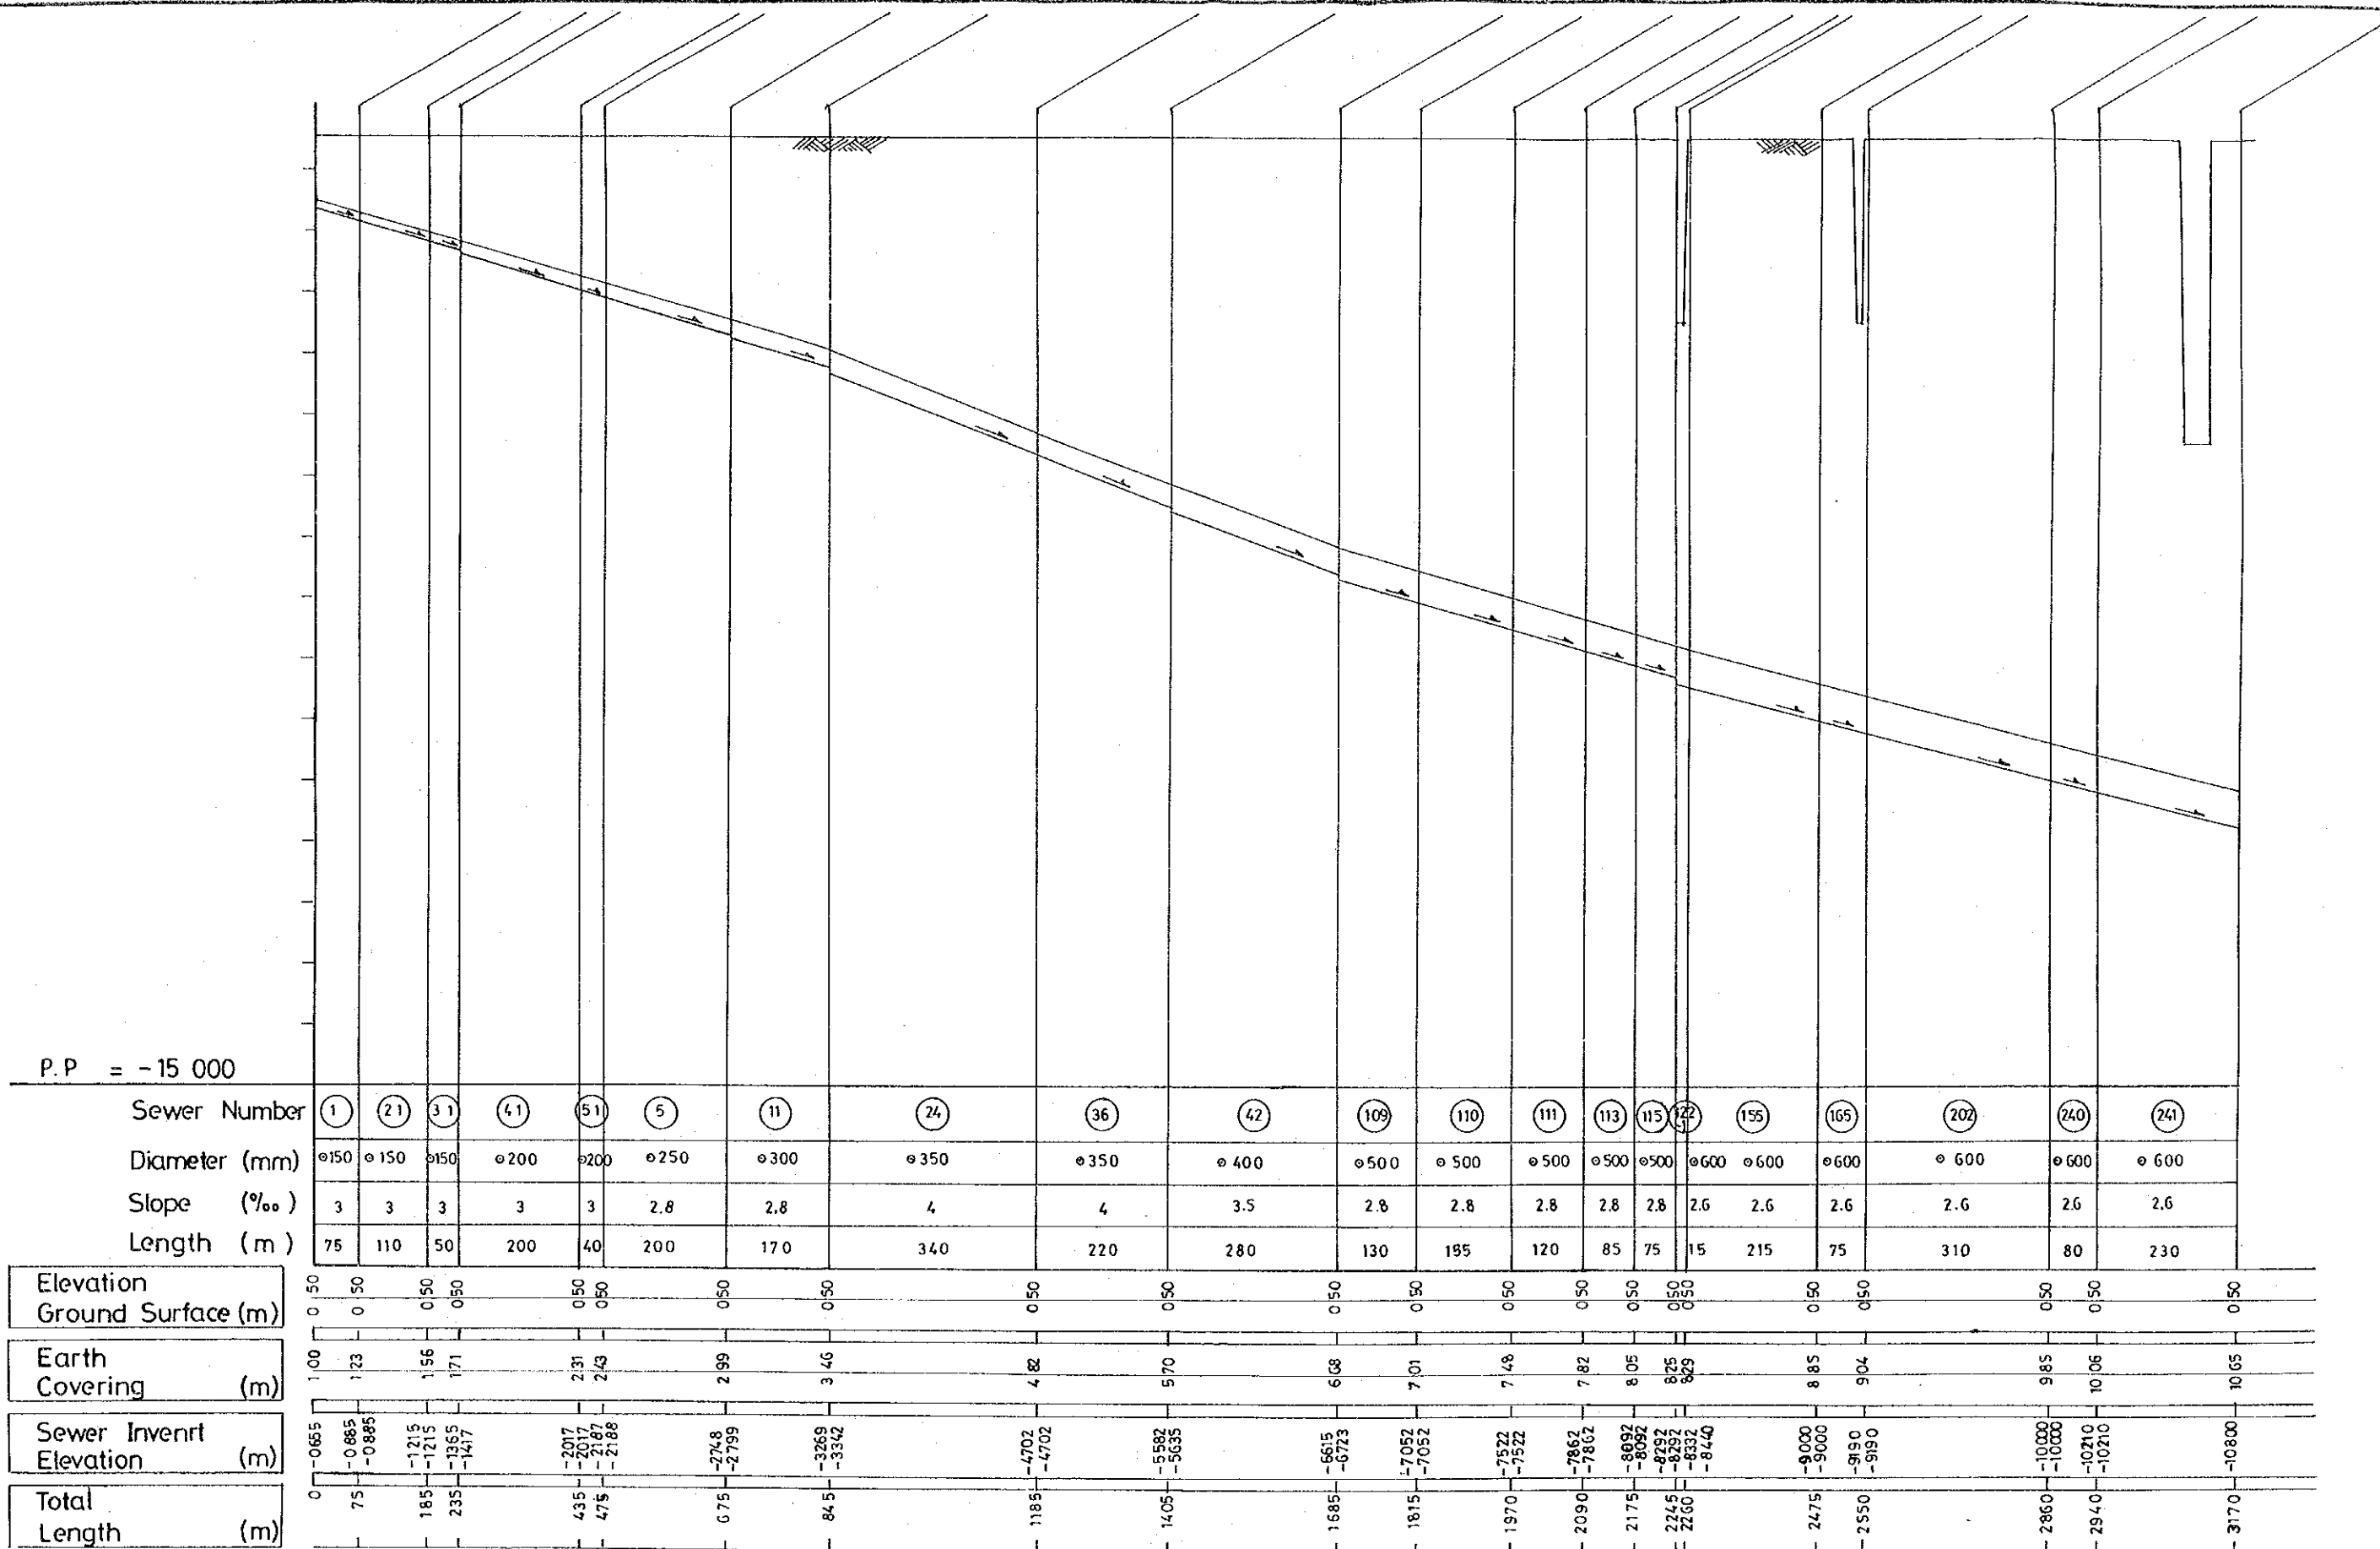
(1) GROUND PLAN AND SECTION PLAN FOR SEWER SYSTEM
